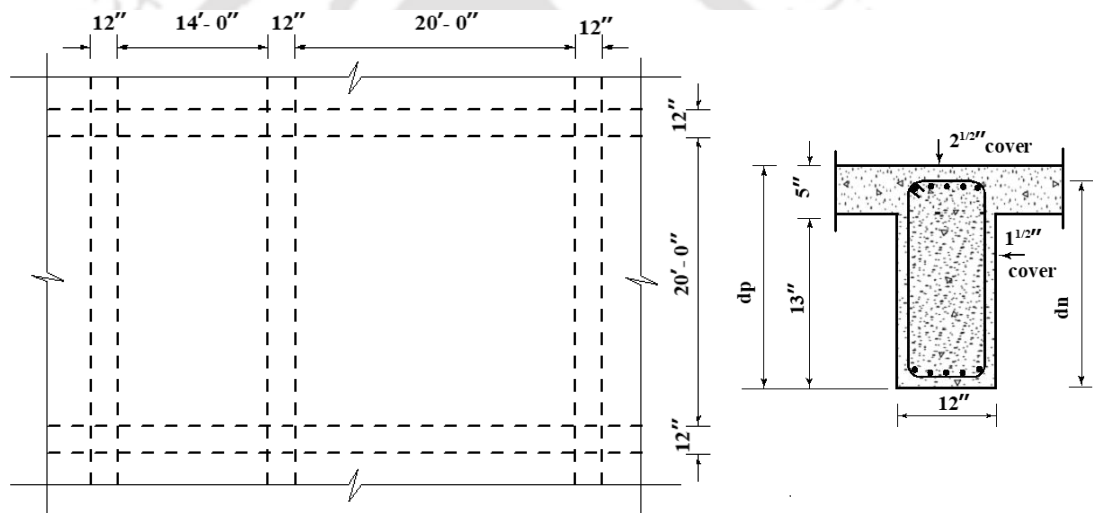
Structural configuration: a) slab, and b) cross-section of beam
